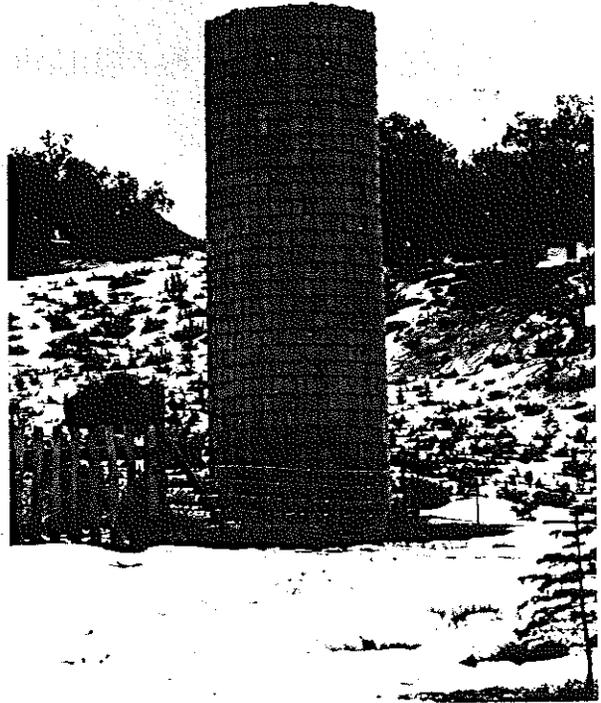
A FODDER SILO CONSTRUCTED OF CONCRETE SLABS. THE INTERIOR IS PLASTERED. 12-FT DIA, 40 FT HIGH.
